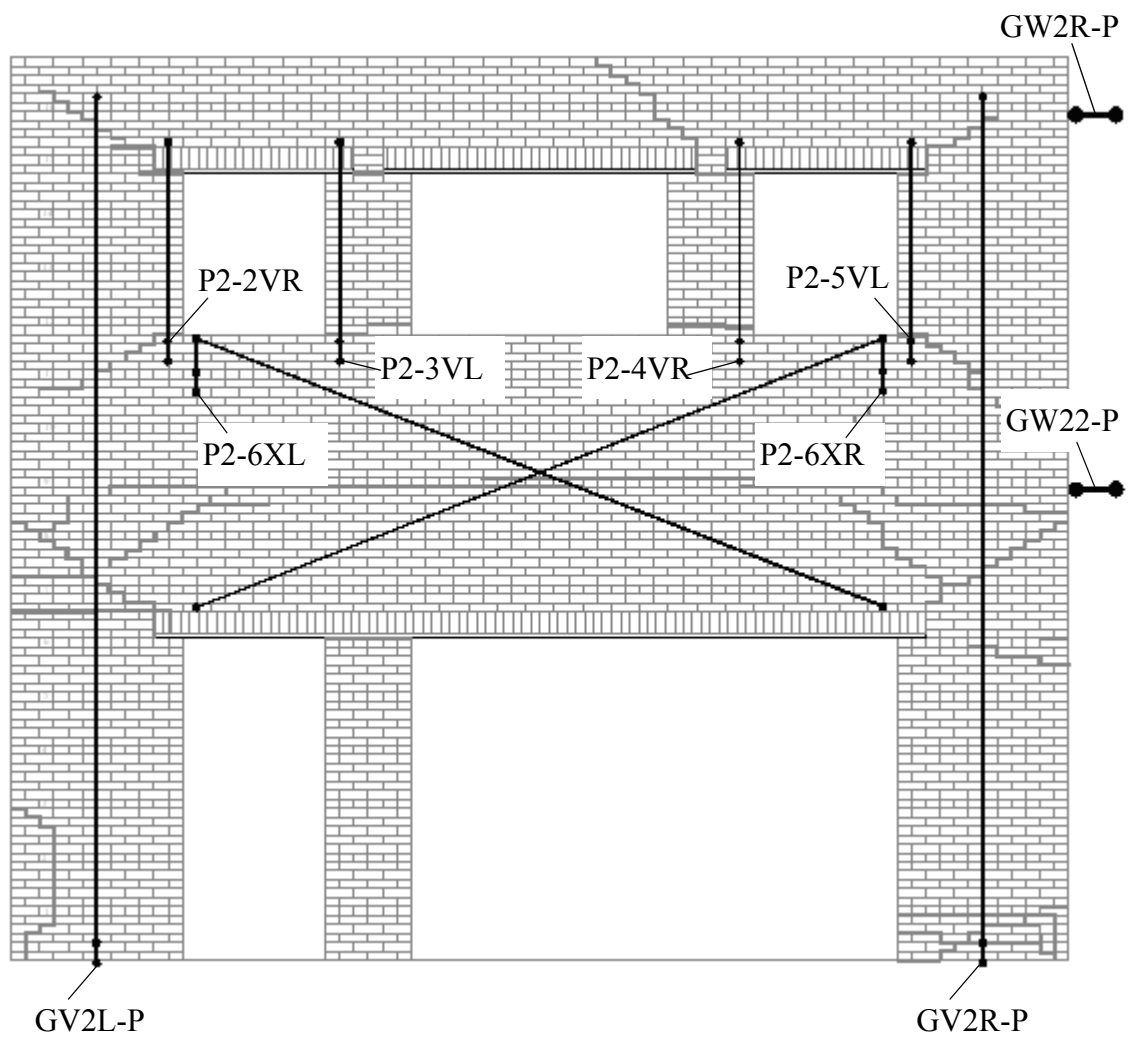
Elevation view of Wall 2 illustrating the location of potentiometers.
